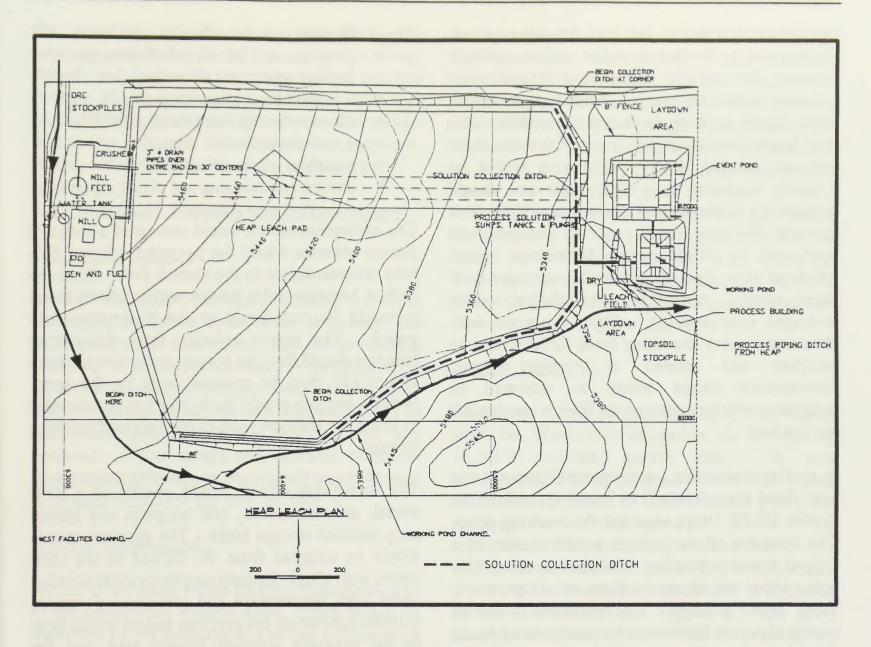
Heap Leach Pond and Solution Collection Ditch.
